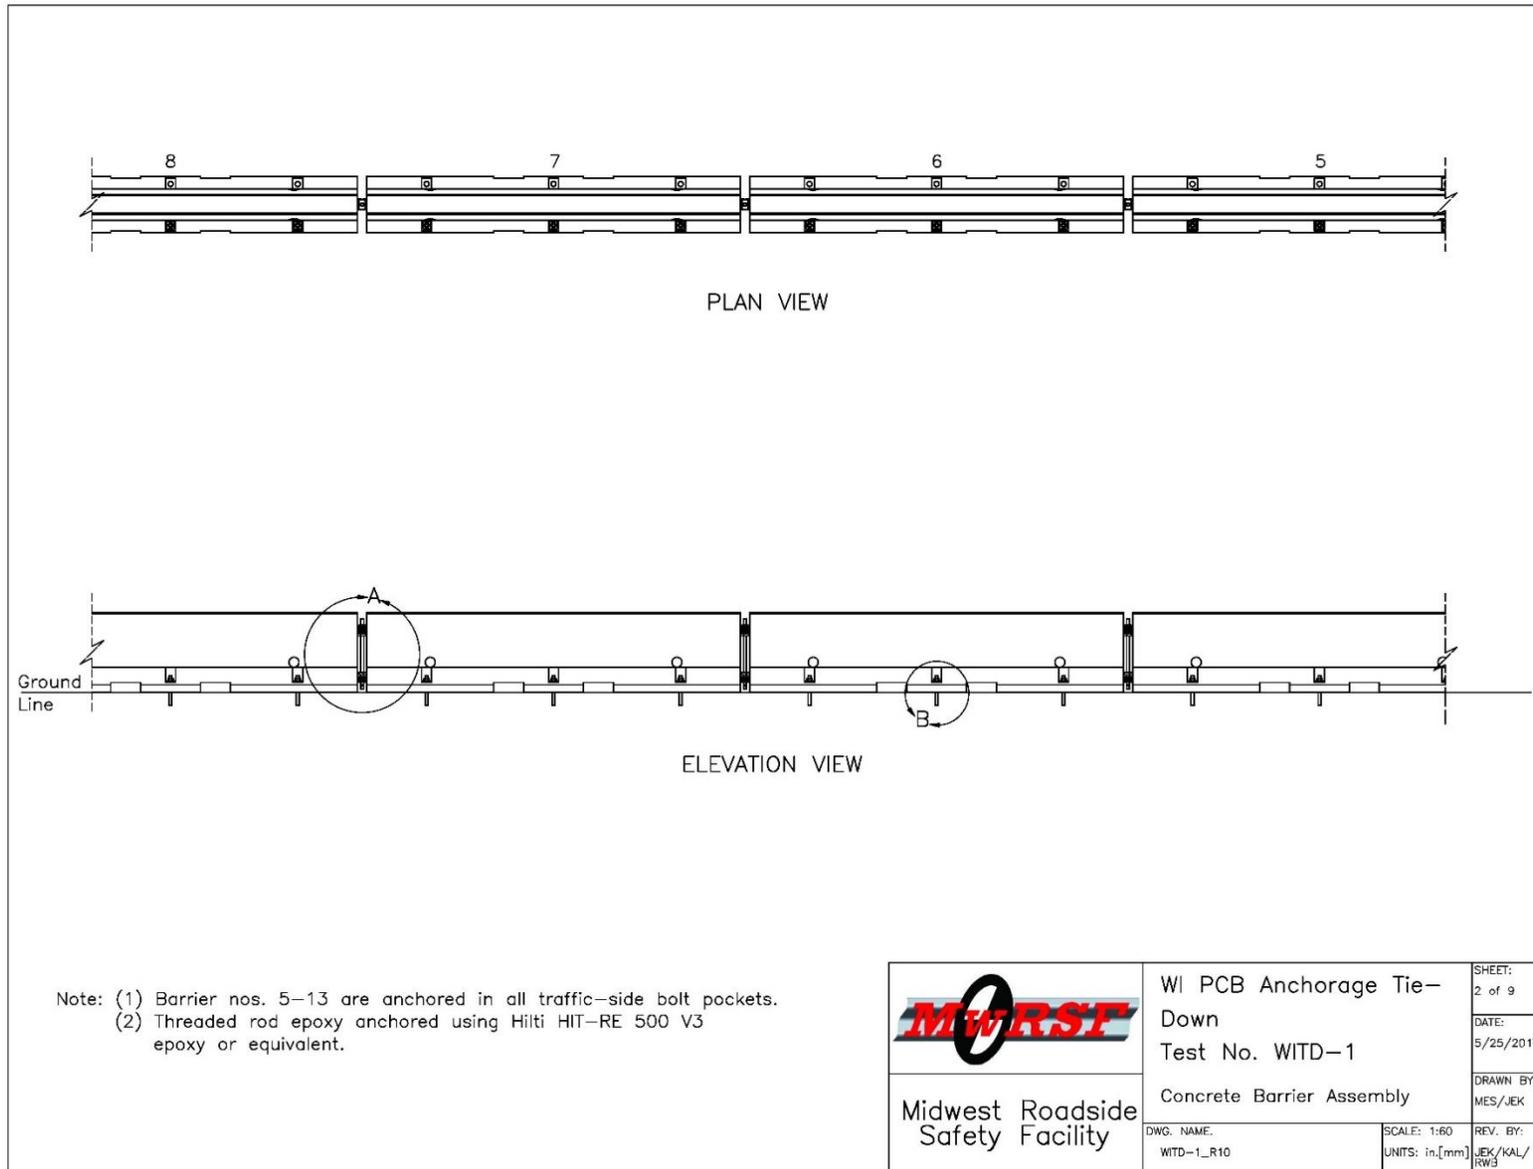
Concrete Barrier Assembly, Test No. WITD-1
